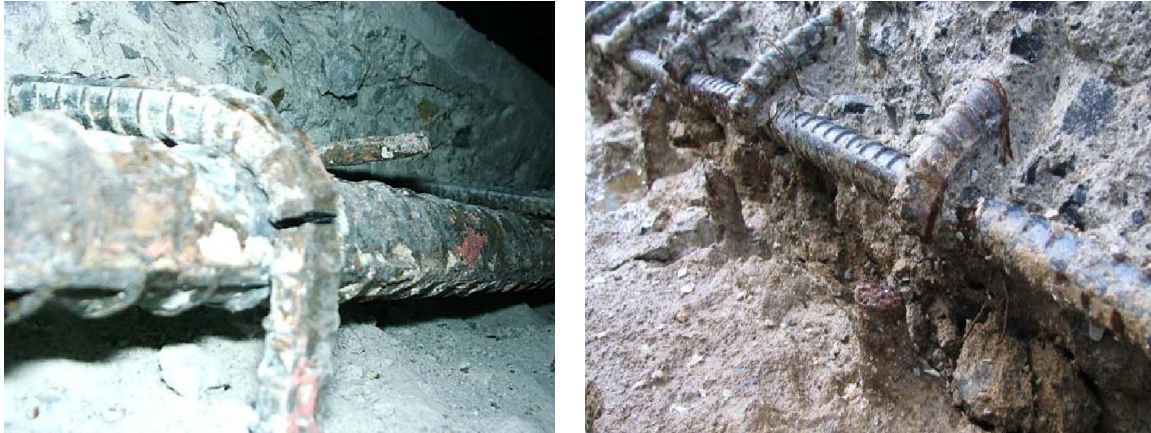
Fracture of Rebar in Bridge Piers in Japan Deteriorated by ASR (Miyagawa et al. 2006; Torii et al. 2008)
